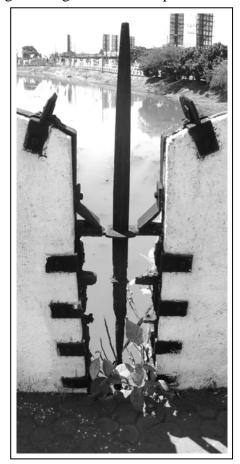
Gubeng Bridge: iron ornaments on the railing.
